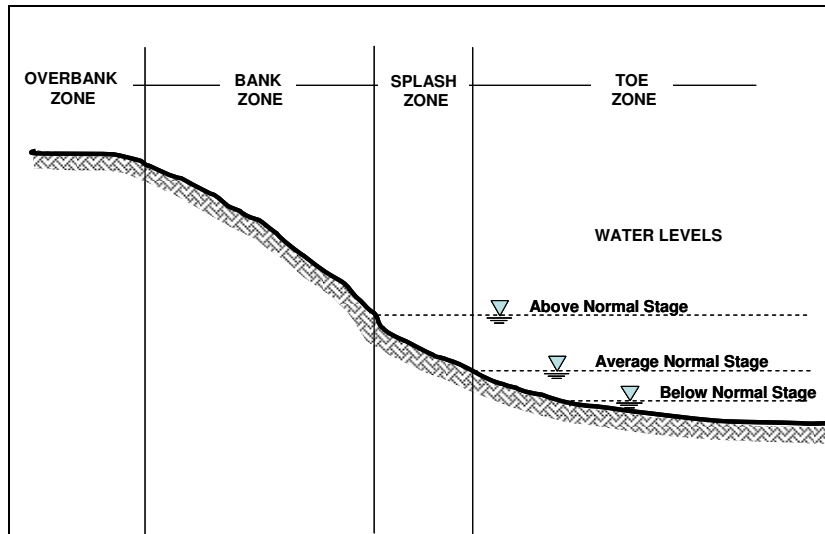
Bank zones defined for slope protection (WES 1998).
